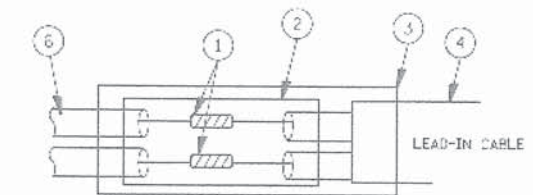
DETAIL "B" LOOP-TO-CONTROLLER SPLICE
